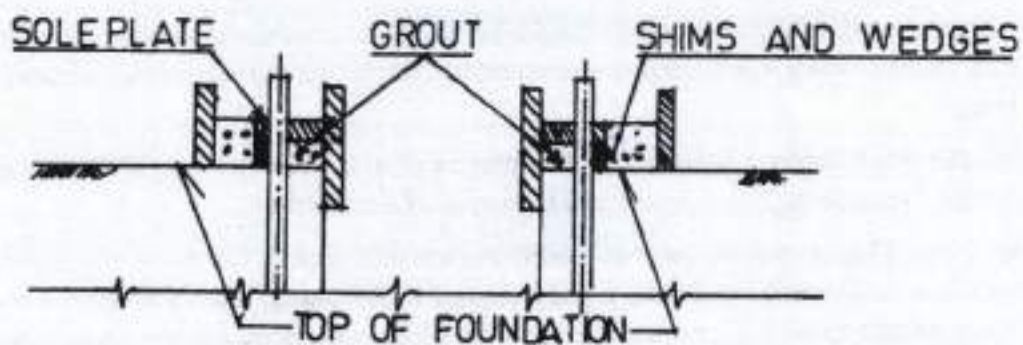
TYPICAL FOUNDATION DESIGN
